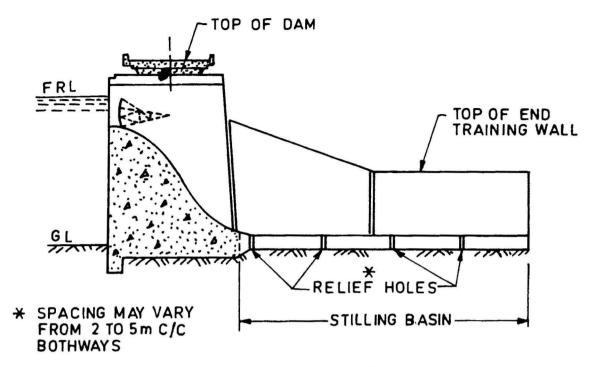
RELIEF HOLES IN THE APRON FLOOR
